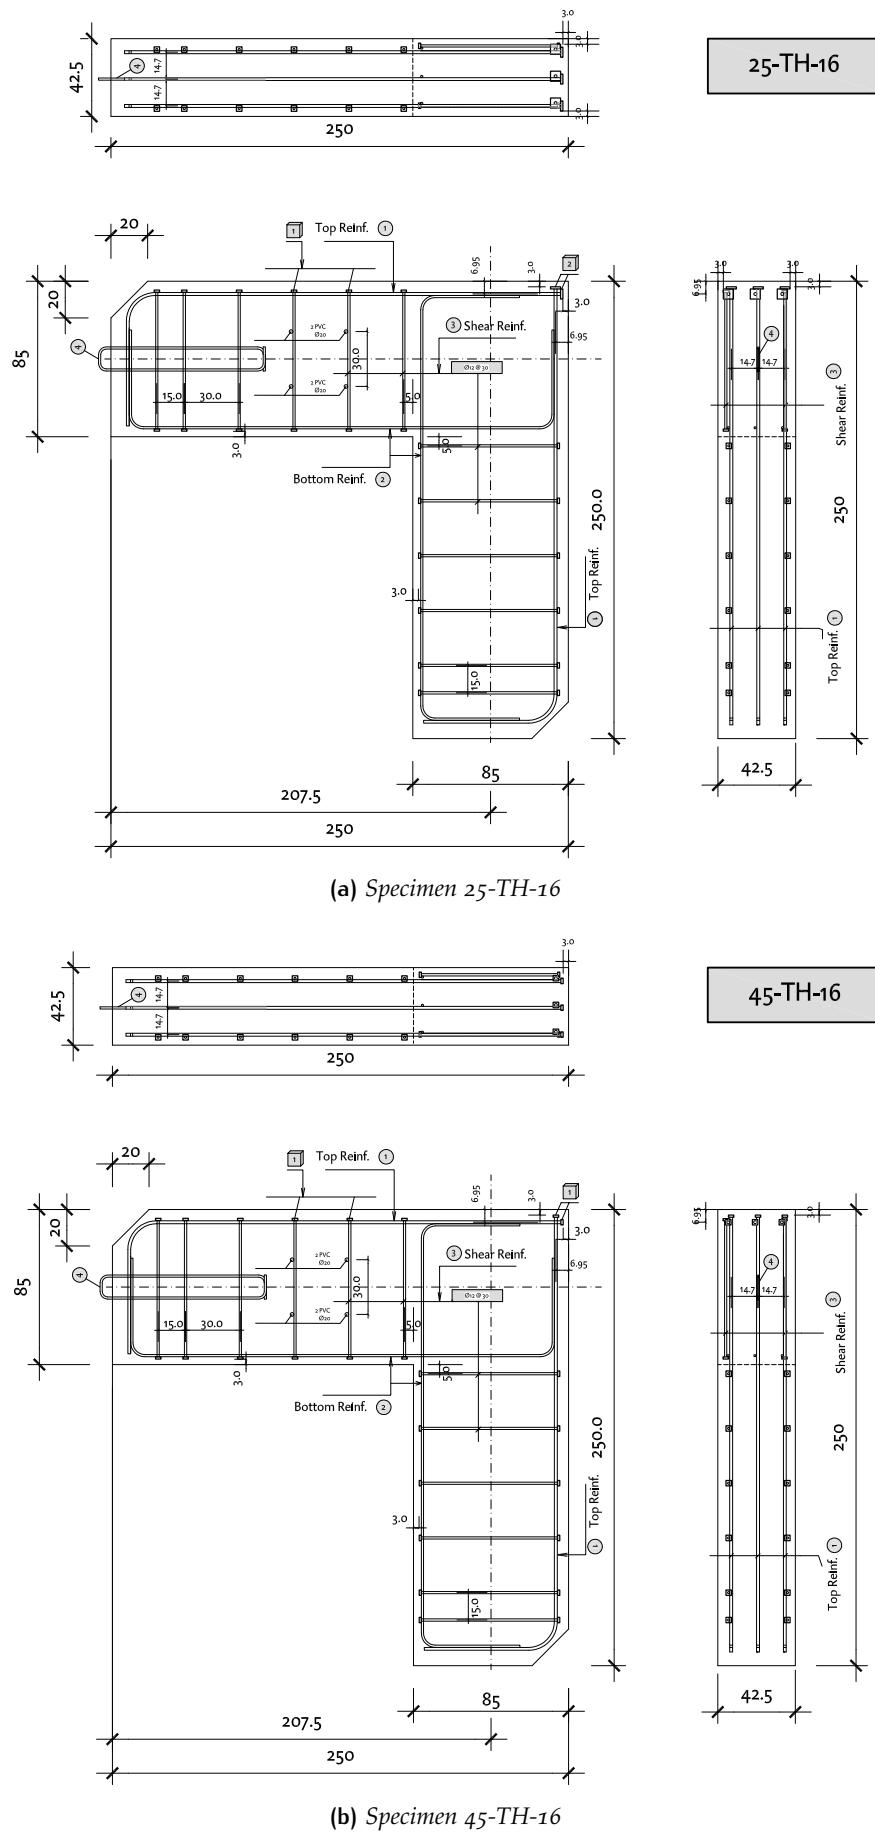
Drawing details of the headed bar specimens with 16 mm rebars
